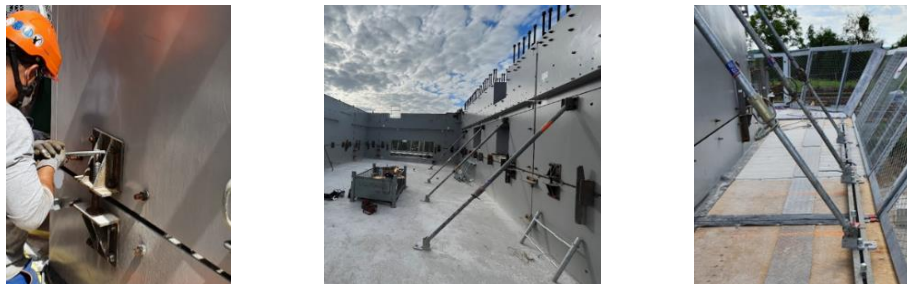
Adjustment with levelling jack (left) – stabilization steel props (middle and right).
